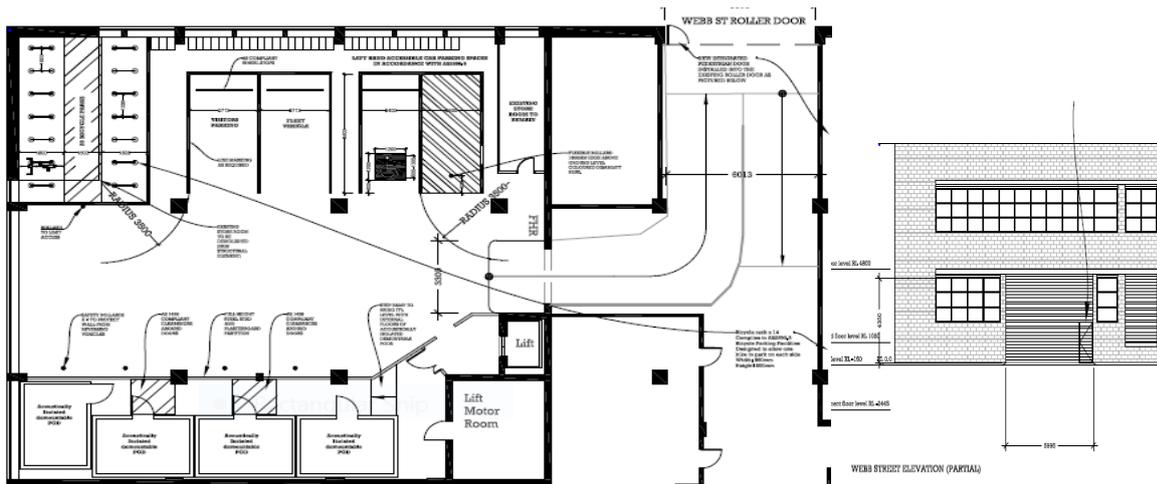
Section 57A advertised basement and new door insert to existing Webb Street roller door
